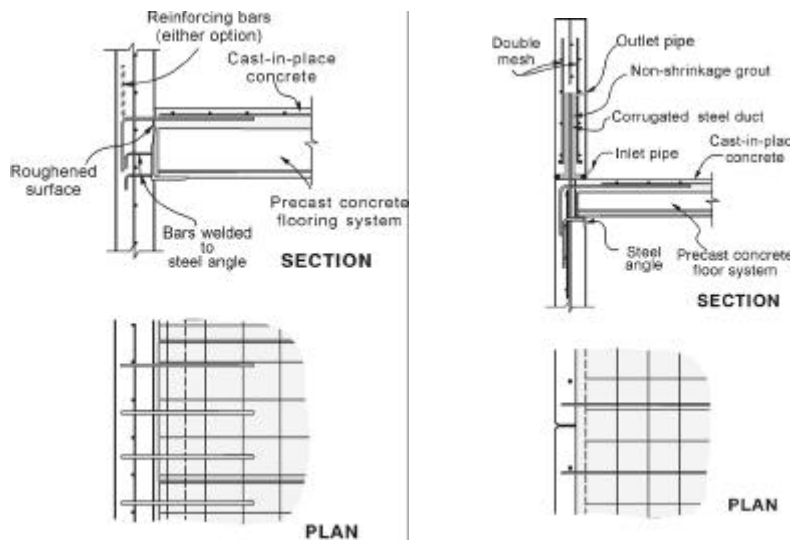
Examples of vertical joints for equivalent monolithic precast reinforced concrete structural wall construction
